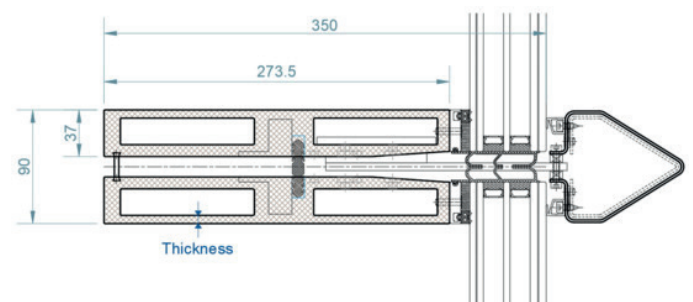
Cross-section of basalt and wood fibre pultruded profiles (Pracucci et al., 2024)
